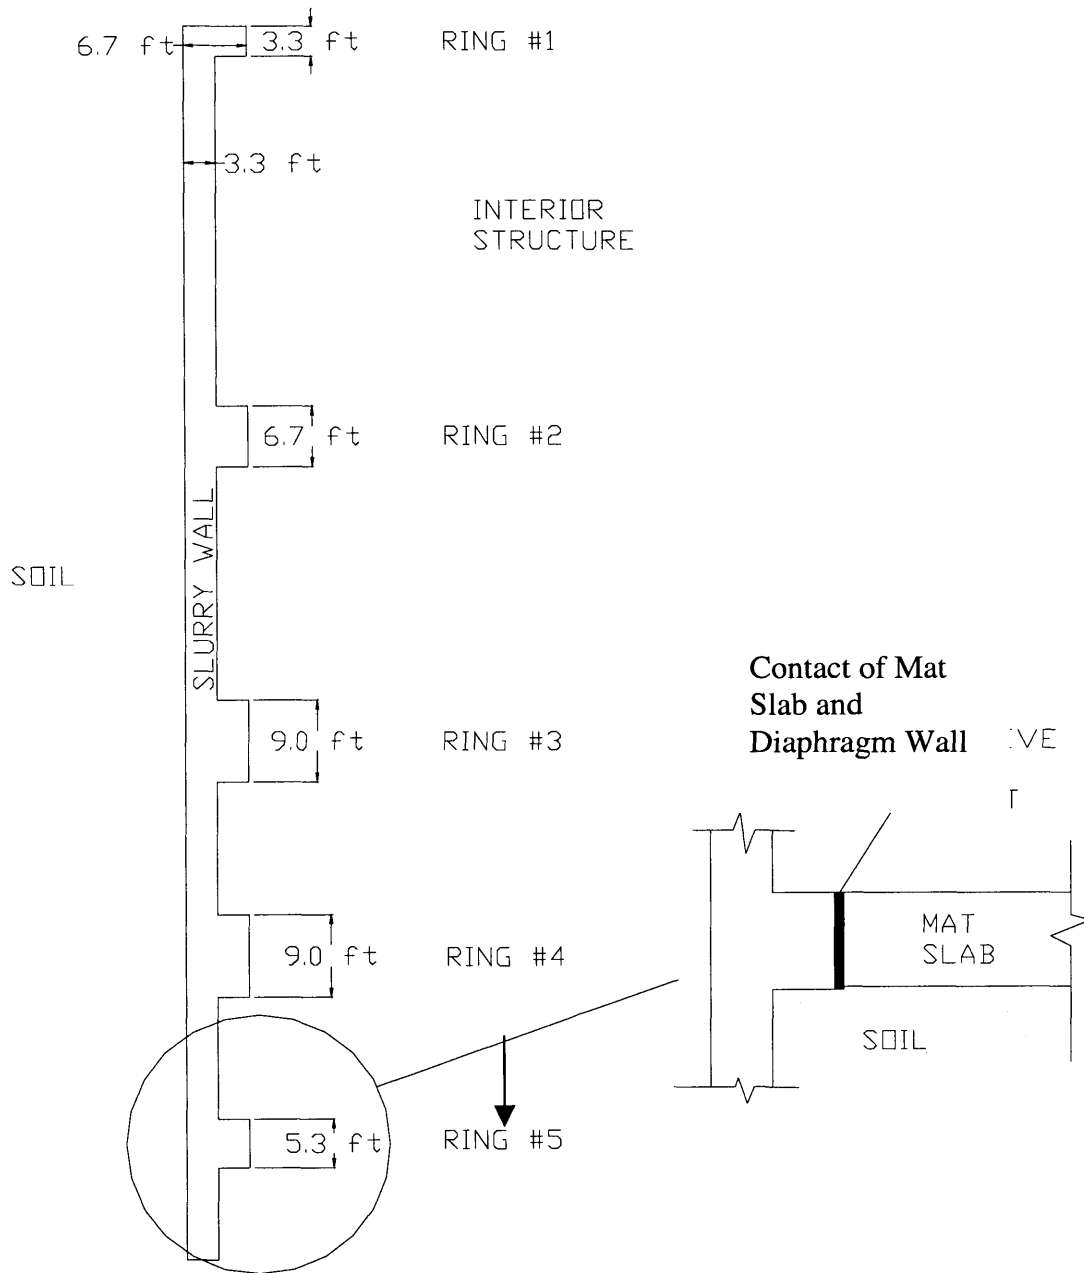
Slurry Wall Profile, Ring Beam & Mat Slab [Craun et al., 2001]
